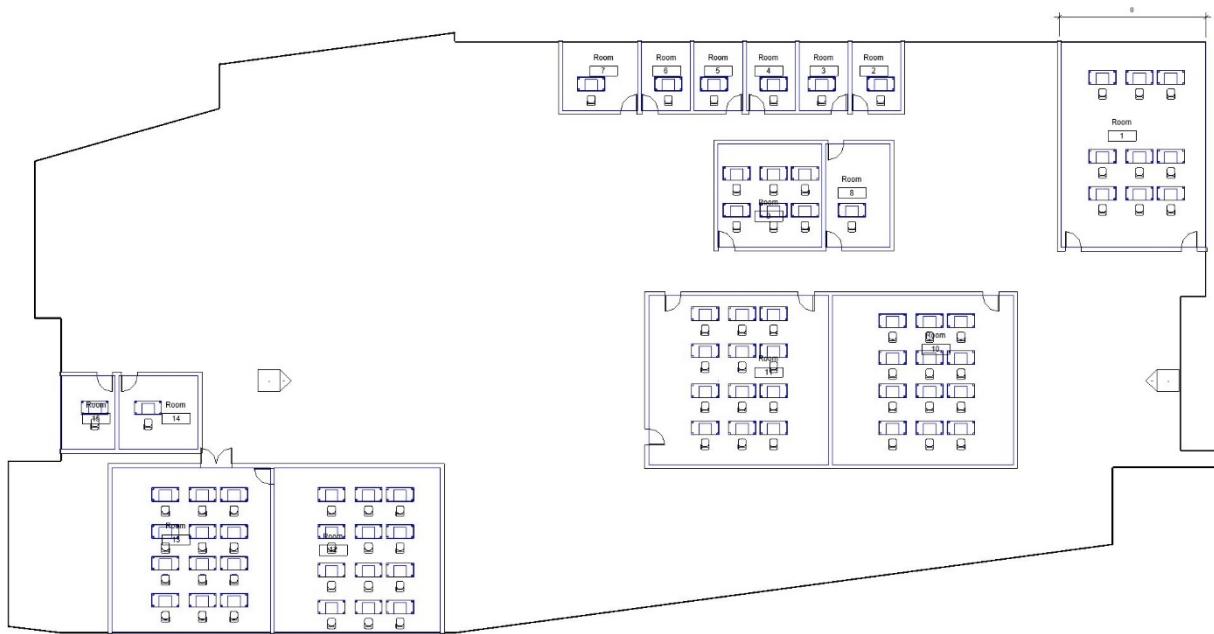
Floor plan, Level 6 of the case study – Furnished - Concordia University, John Molson Building
